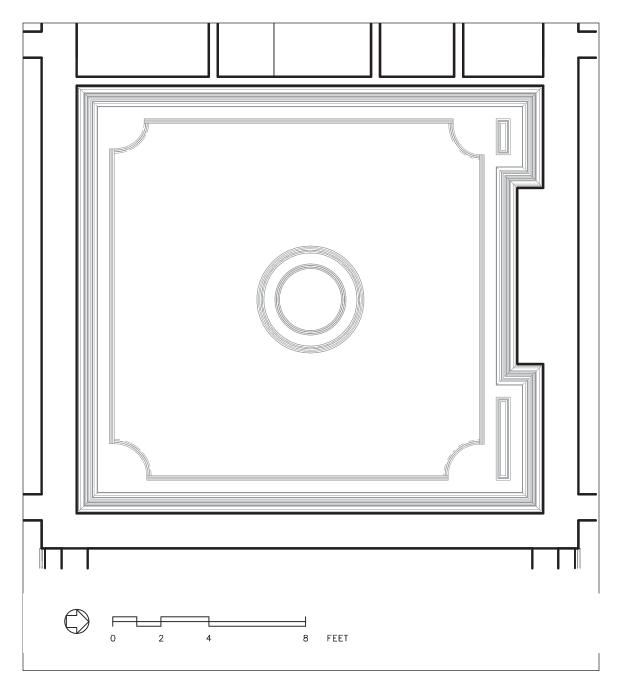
Entrance hall (101) reflected ceiling plan. JGWA, 2024.
